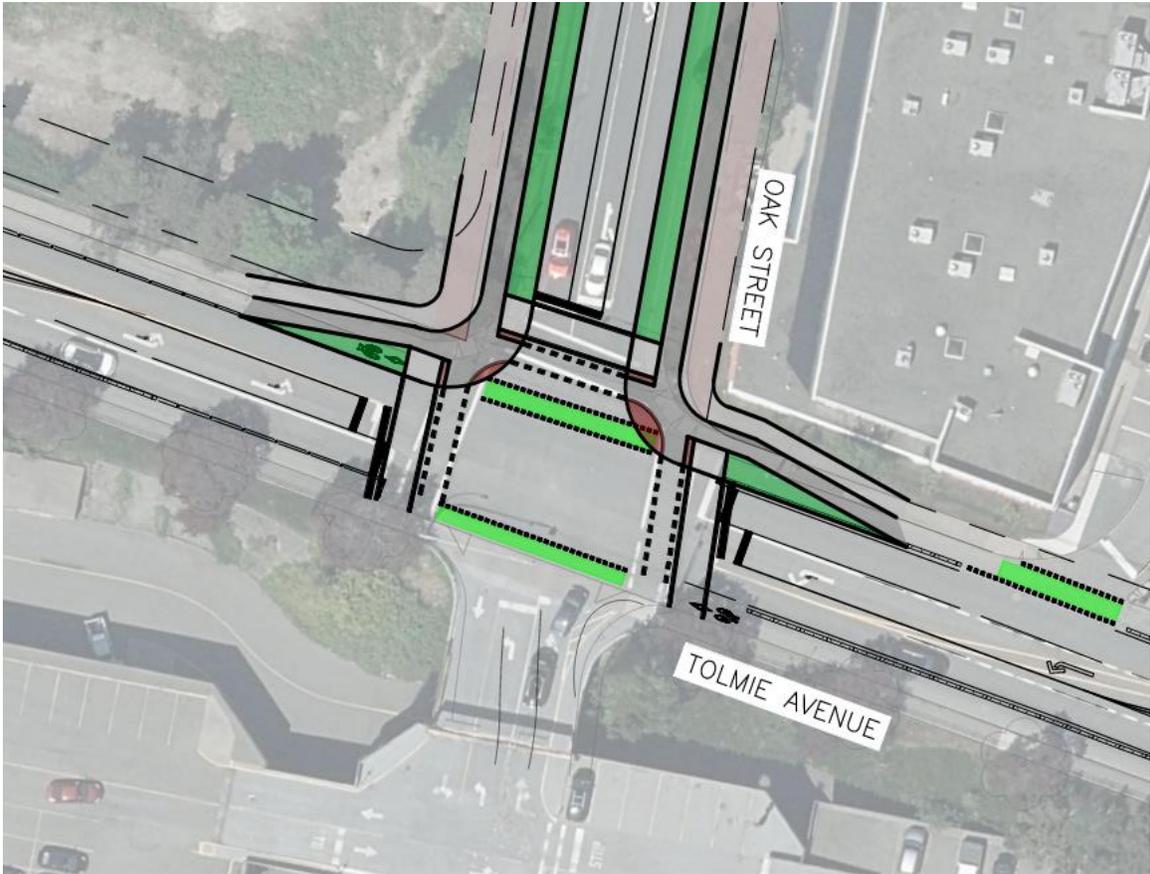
Oak Street / Tolmie Avenue Preliminary Intersection Design
